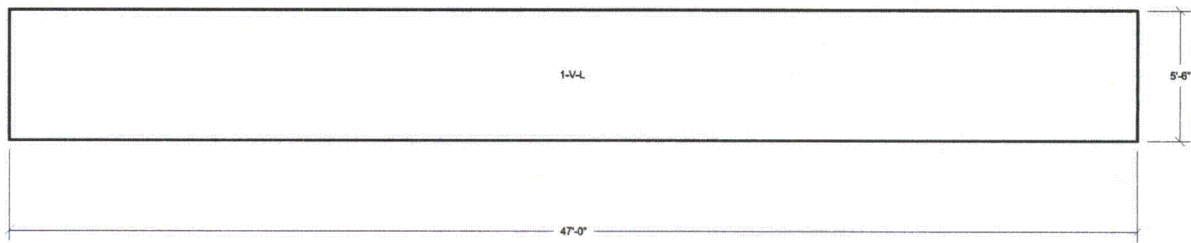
H.7-13: Tunnel Walls Looking From Outside
